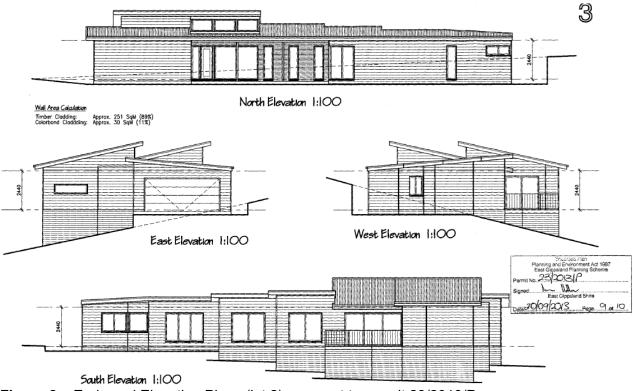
Endorsed Elevation Plans (lot 2) pursuant to permit 23/2013/P
